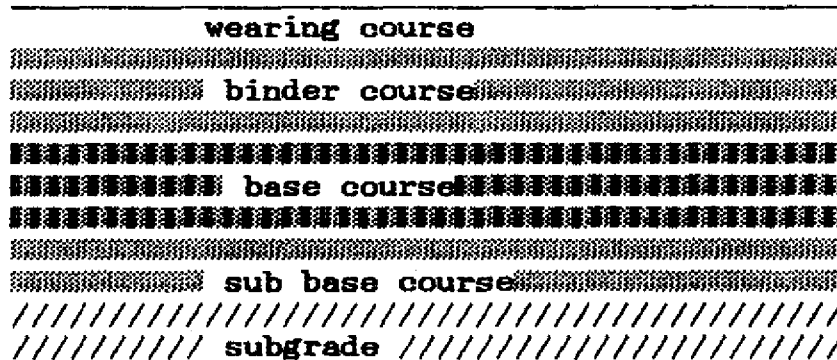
Typical cross-section of a Flexible Road Pavement Structure.
